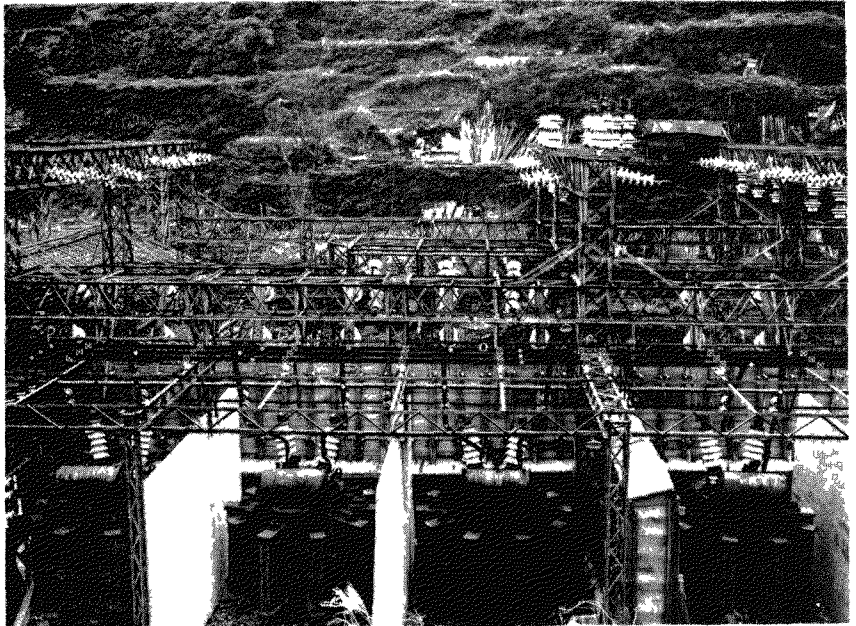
Reinforced-concrete blast walls protecting transformers (1 mile from ground zero at Nagasaki).
